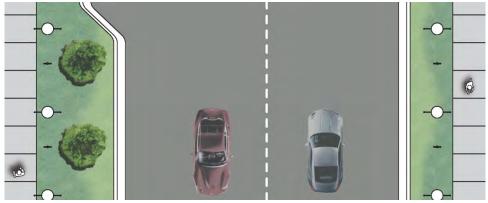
Landscaped bulbouts provide space for additional boulevard treatments.
